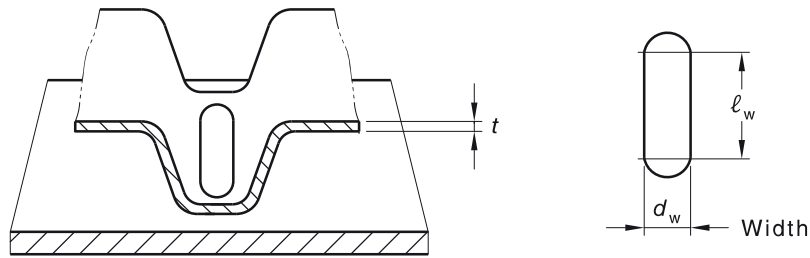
ARC SEAM WELD—SHEET TO SUPPORTING MEMBER IN FLAT POSITION
